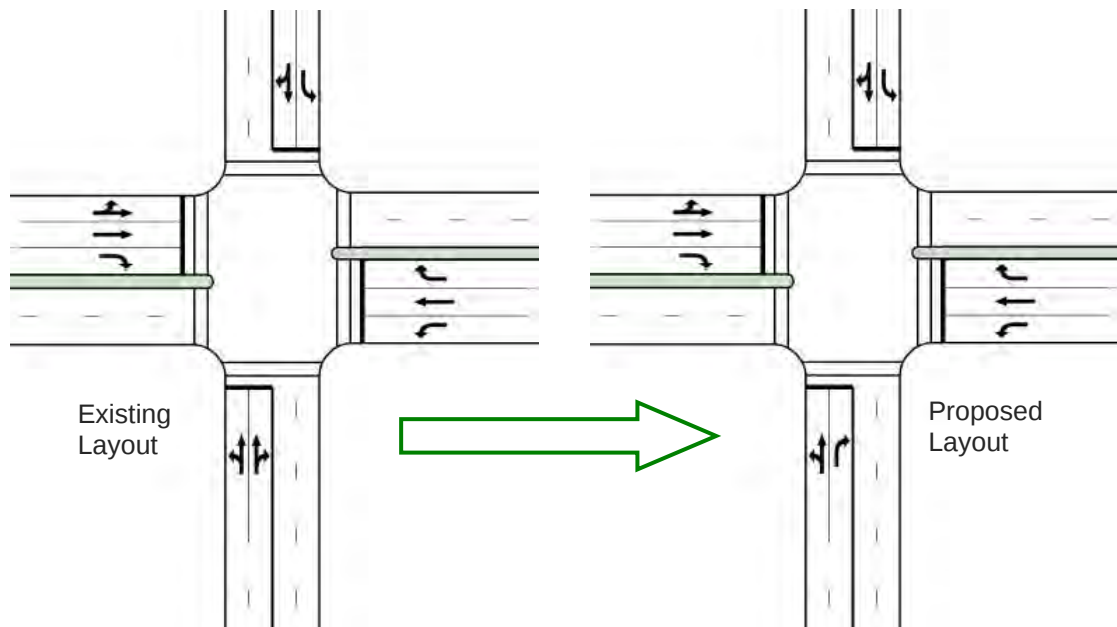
Proposed modifications to lane marking on south approach to the signalised intersection of Rooty Hill Road South with Francis Street and Eastern Road
